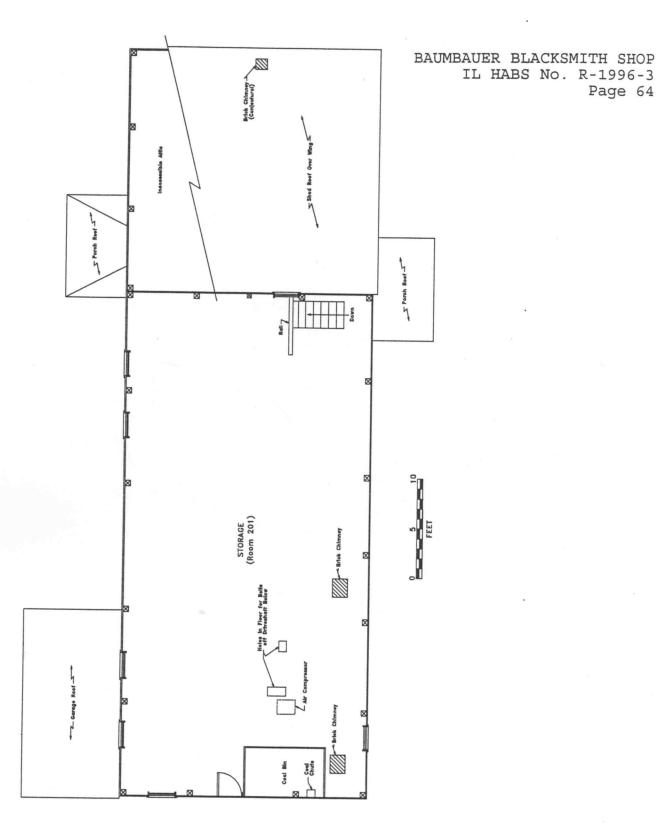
Second floor plan of the Baumbauer Blacksmith Shop, ca. 1925.
